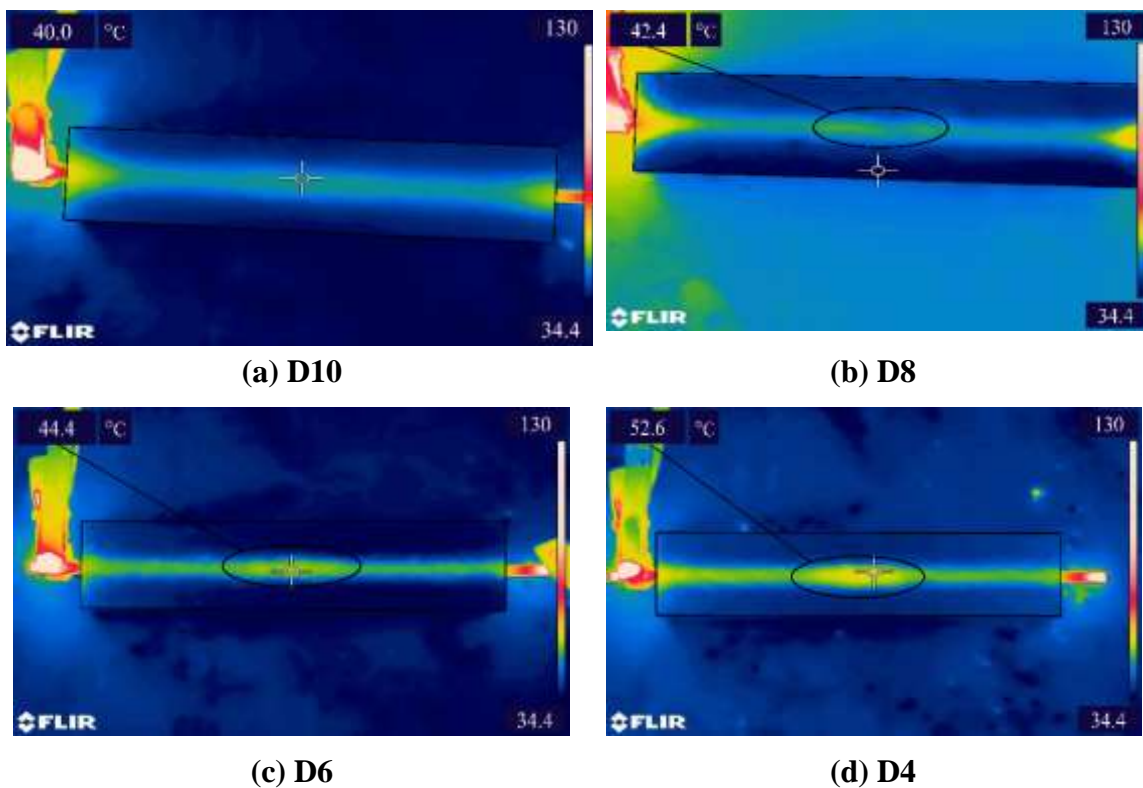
IRT images of rebar's in concrete for Simulated Damage 1 (Pitting)
